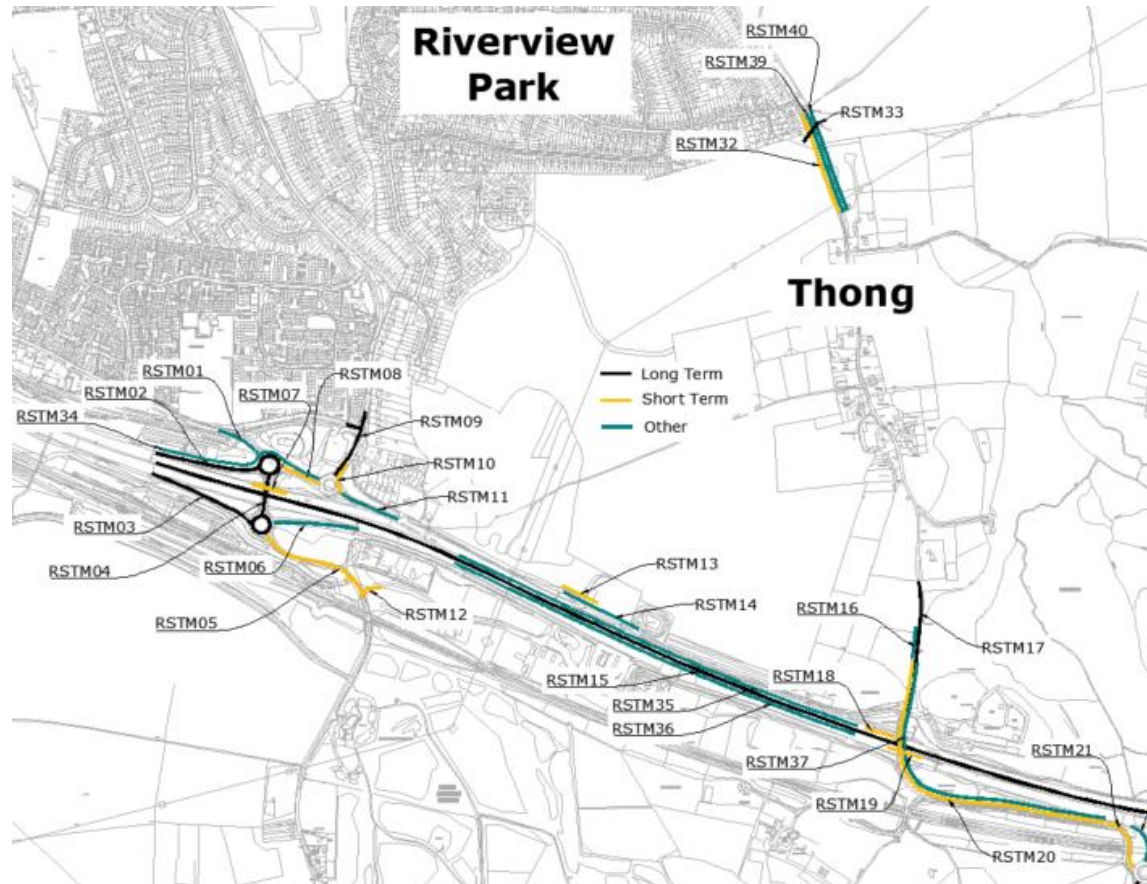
Roads South traffic management measures location plan (2 of 2)
